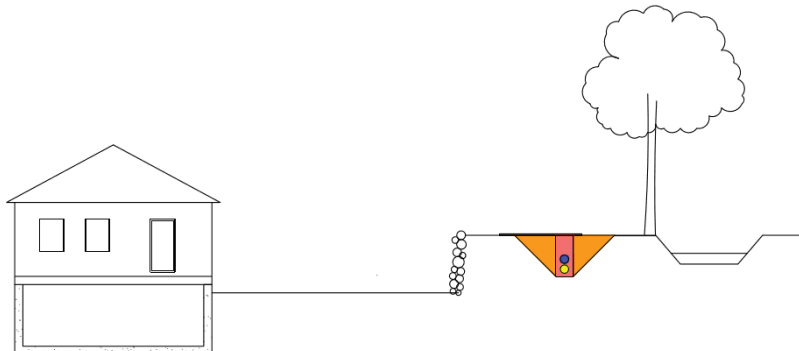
Cross section of cut off wall with long strawberry and piped canal
